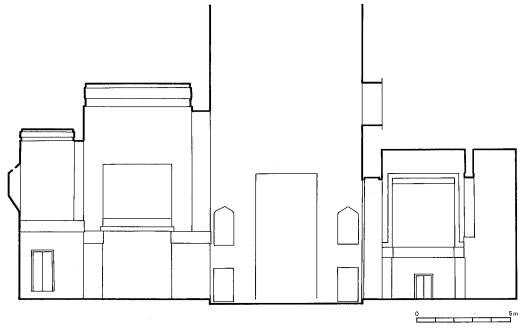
Qā'a of Ahmad Bey Kohya. Section (reconstruction).
